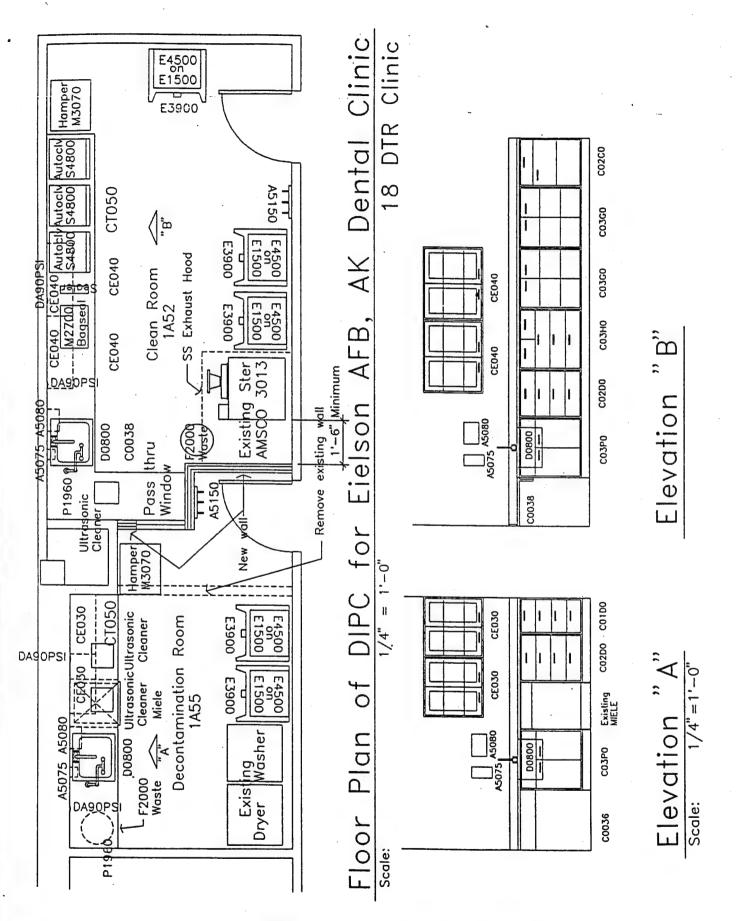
Medium Dental Instrument Processing Center Floor Plan
